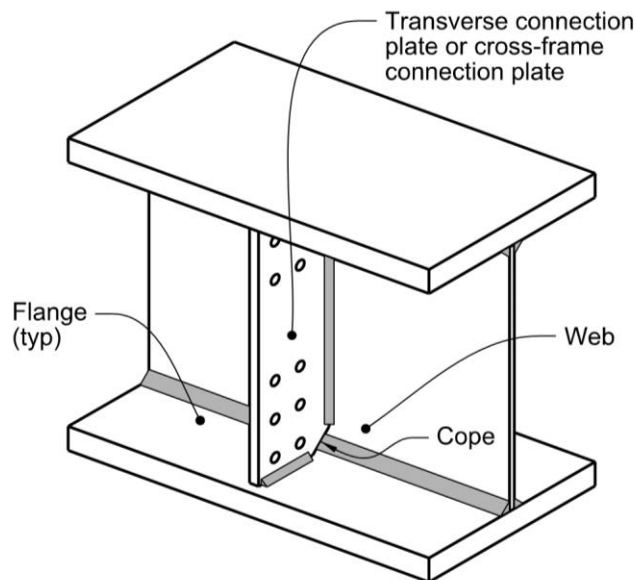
Intersection of a transverse connection plate with a girder web and a girder flange (welded to both flanges).
